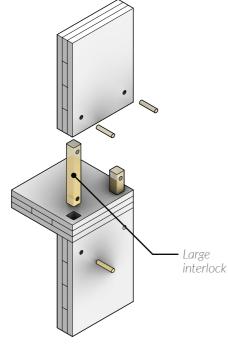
70. Exploded isometric view of joint type C (large interlock).
